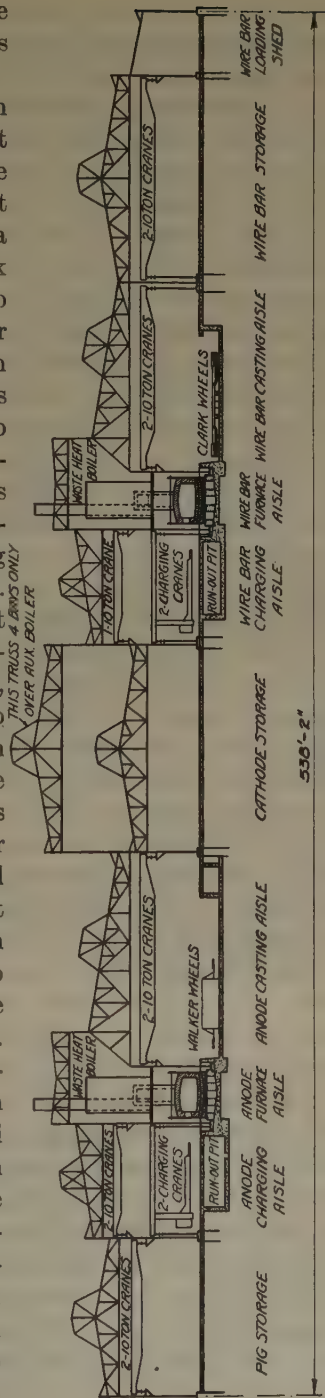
SECTION THROUGH CASTING BUILDING.
